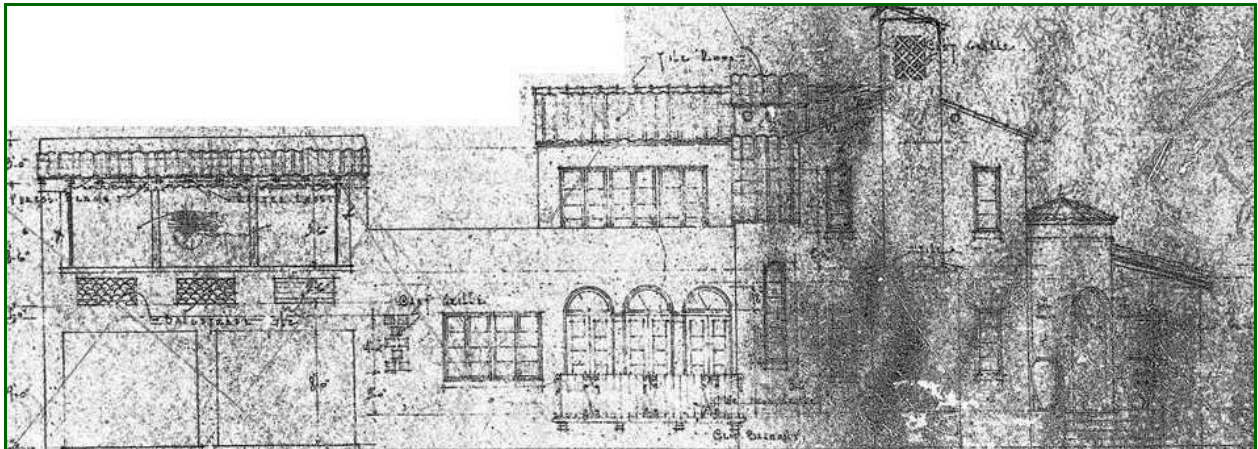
Side (North) Façade: Permit #1749 Drawing, 1925
